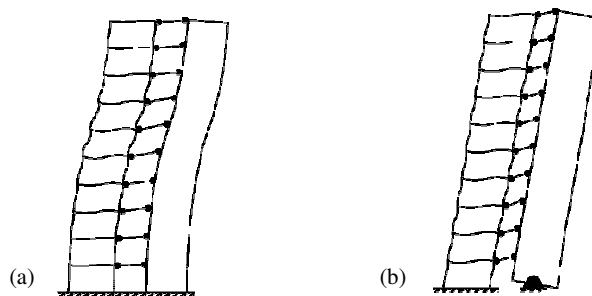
Systems analyzed by Alavi and Krawinkler: (a) fixed wall, (b) hinged wall
